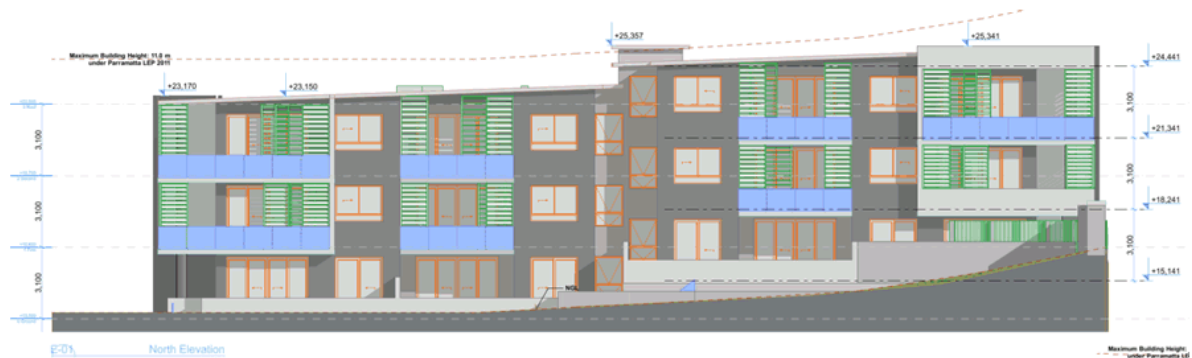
Approved North Elevation under DA/544/2021. Source: Design Effects Architects
